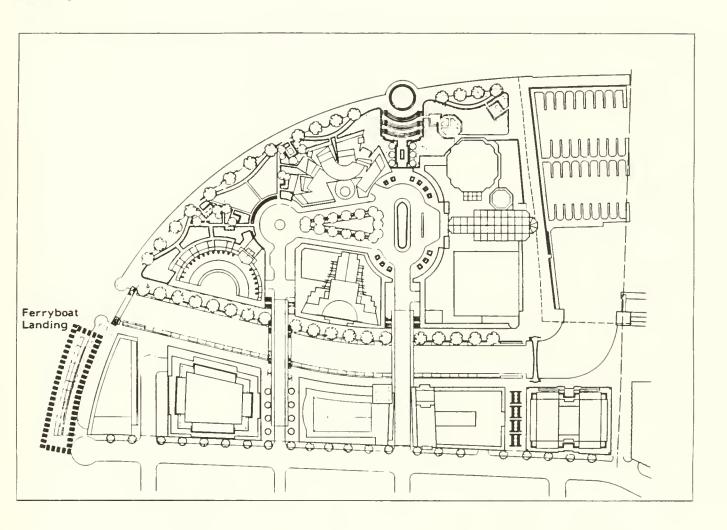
Location of Proposed Fan Pier Ferryboat Landing
